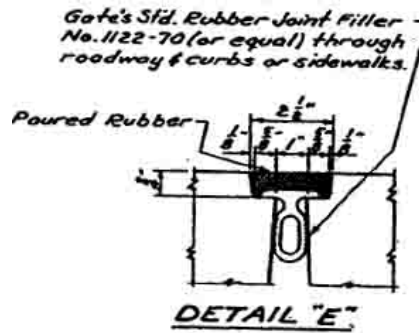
Bridge 5/227 Expansion Joint Detail
